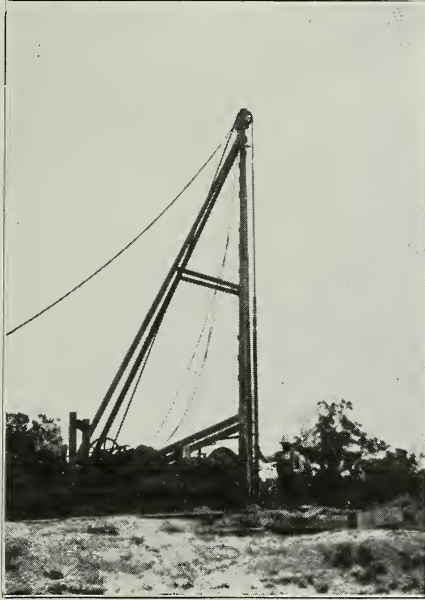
Churn drill used for making primary blast holes. (Photograph by courtesy of American Silica Sand Company.)
